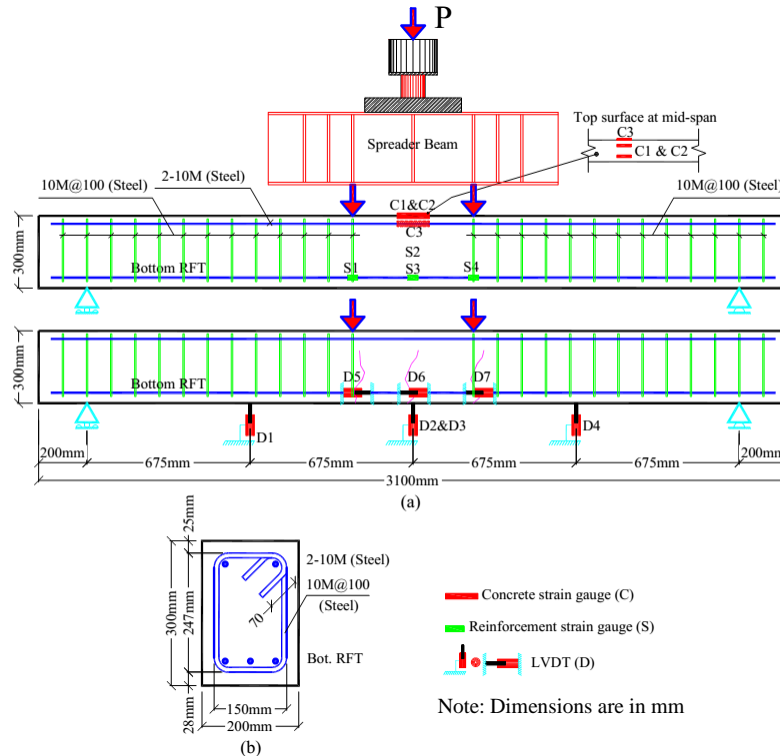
Schematic drawing for concrete dimensions, reinforcement details, typical location of instrumentation and test setup: (a) Elevation; (b) Cross- sections
